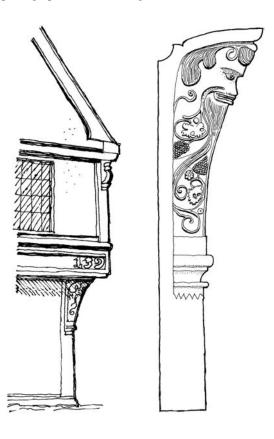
(left) Reconstruction of the building on the corner of High Street and West Stockwell Street (corpus no. 43) (not to scale). The building was demolished in the late 19th century in advance of the construction of Belcher's Town Hall
